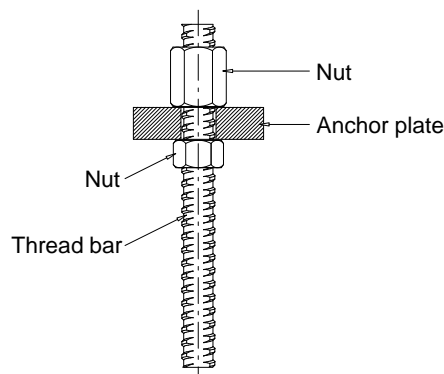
Anchorage with anchor plate – Schematic example
